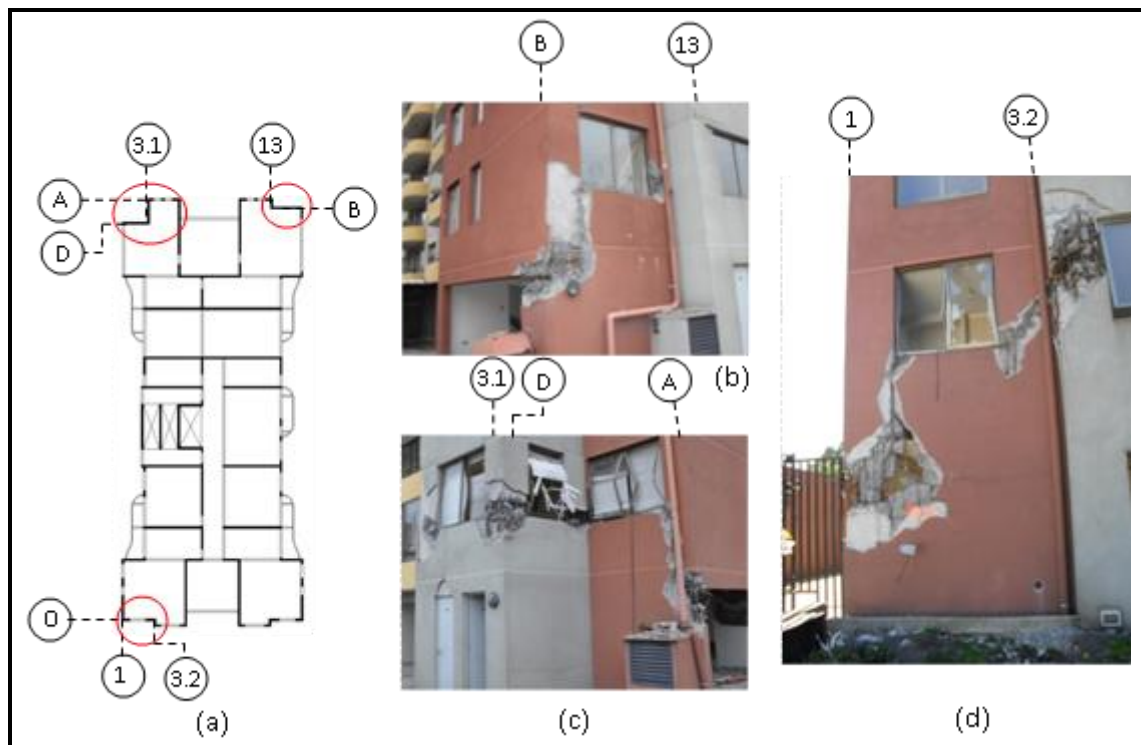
Multistory damage at CM-3. (a) Structural plan of story 2, (b) N-E corner, (c) N-W corner and (d) S-W corner.
